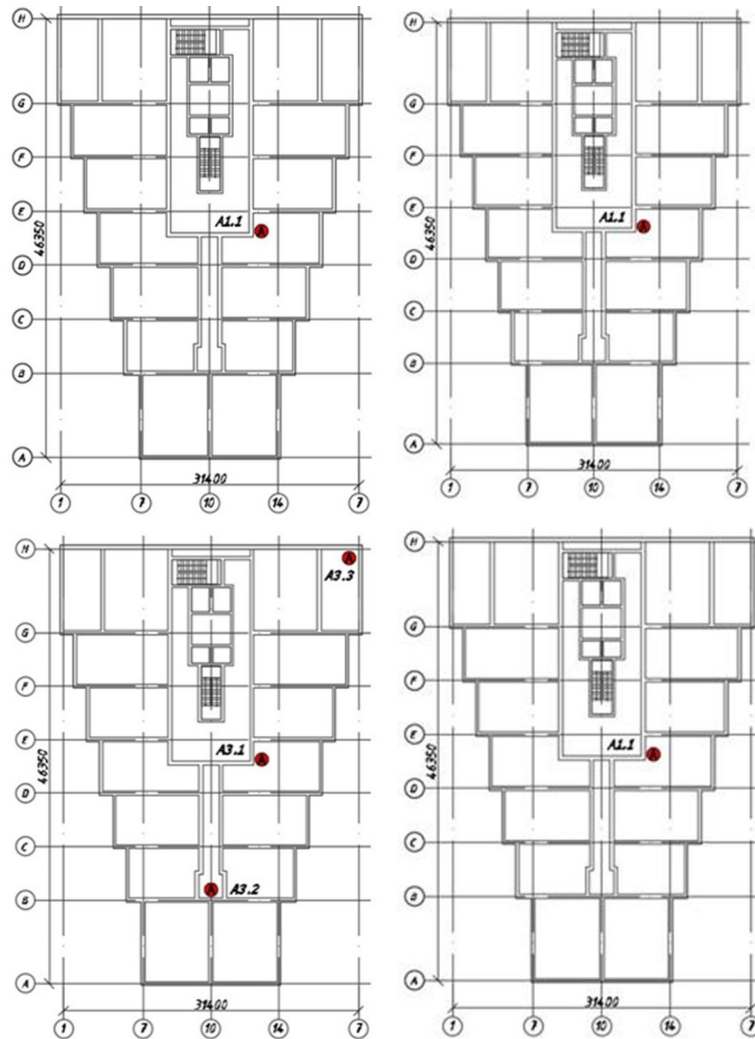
Location of accelerometers for the cross-wall structural system on 11, 22, 33, 44 floors
